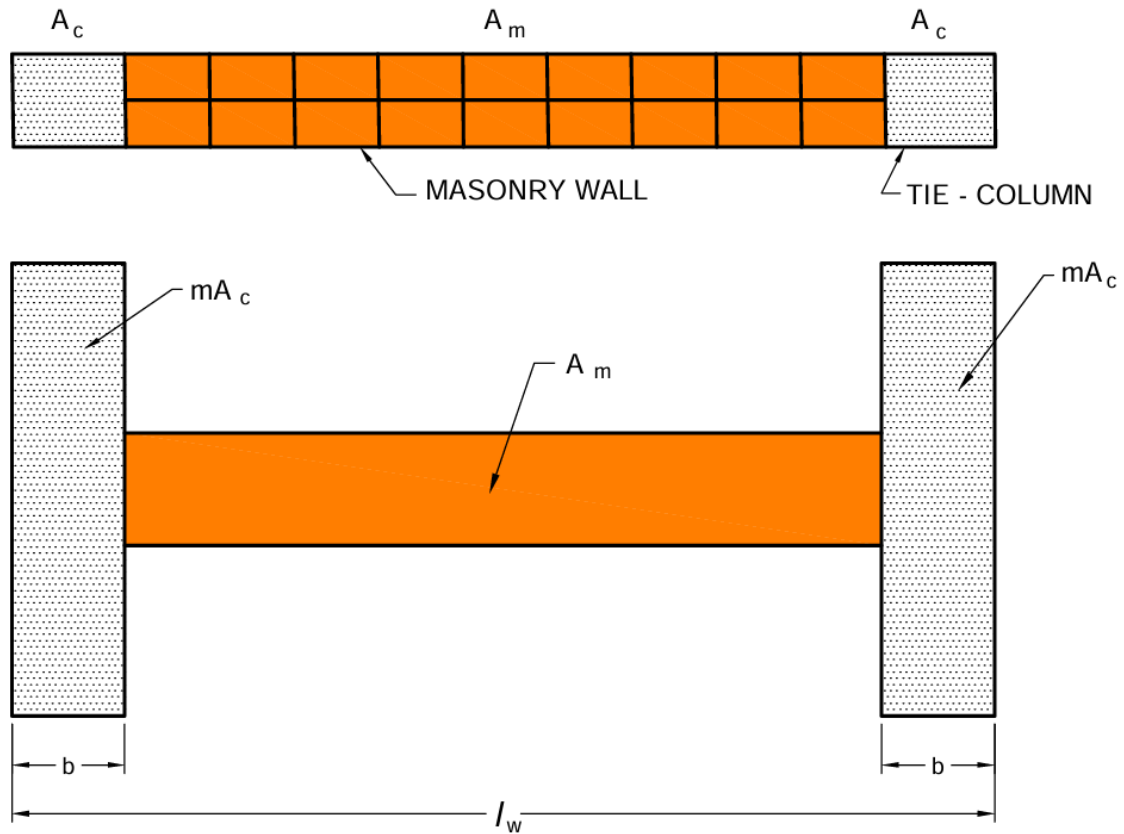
TRANSFORMED SECTION PROPERTIES OF A CONFINED MASONRY PANEL
